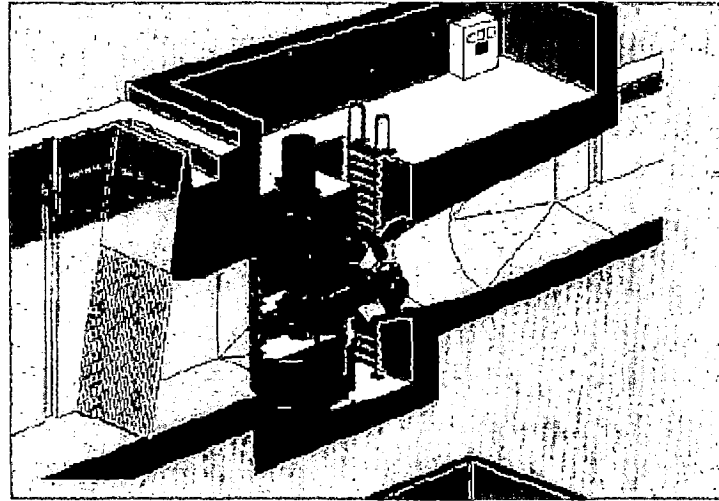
Horizontal axis pit Kaplan turbine with right-angle gear driven generator [10]
